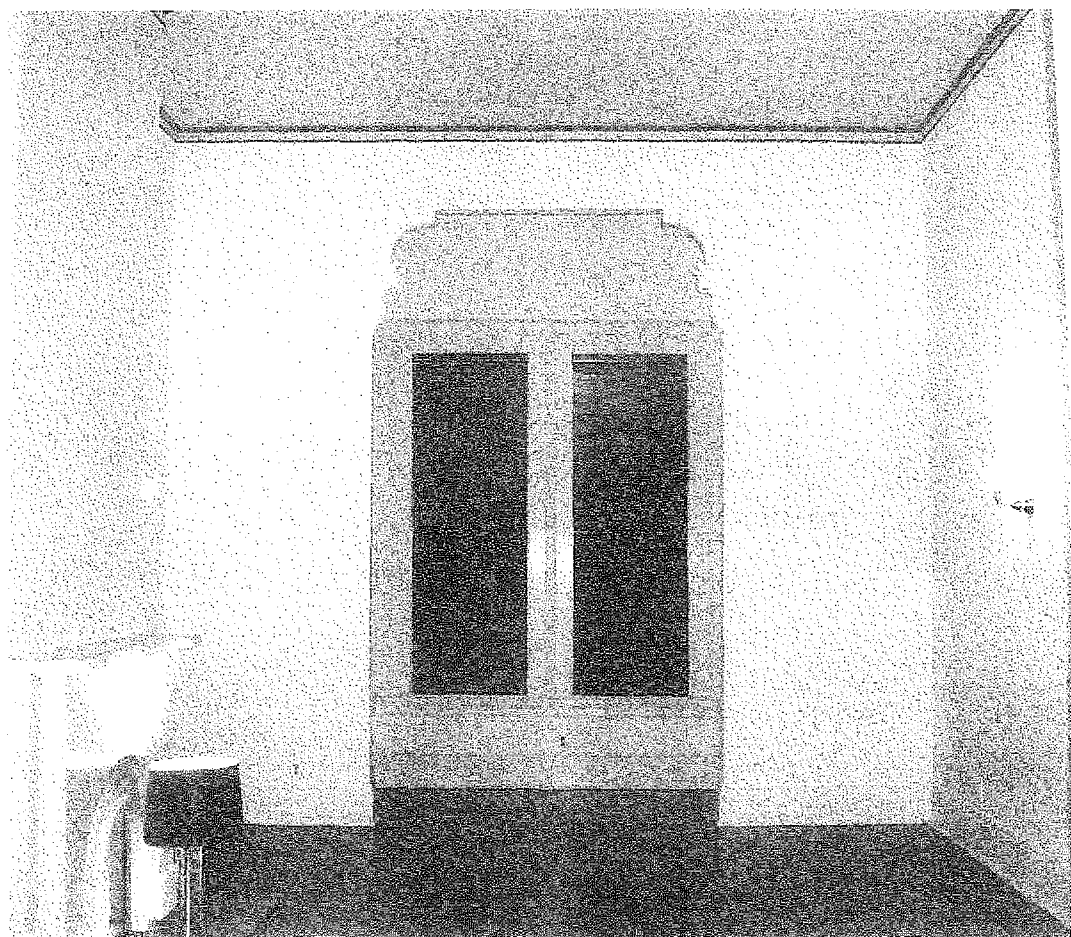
Ceiling and floor trim. Front parlor bay window arch and detail; sconces.
